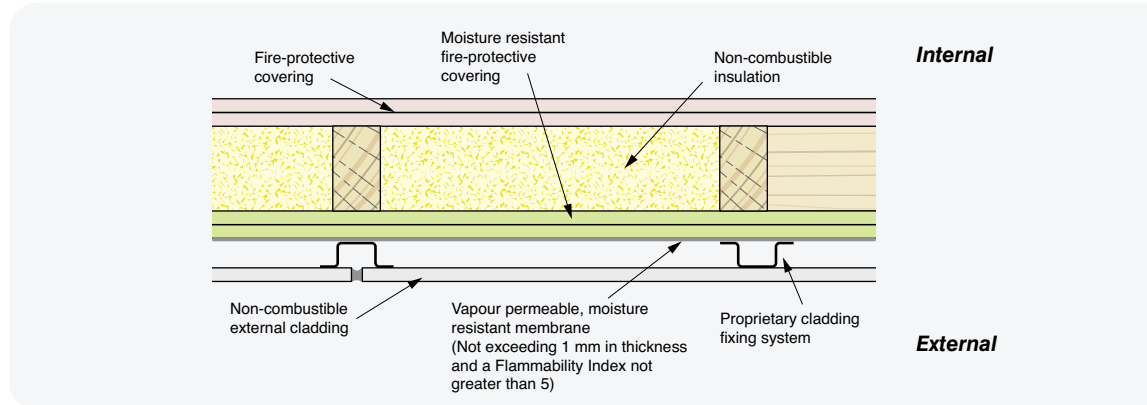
Fire-protected timber frame external walls with lightweight cladding.
